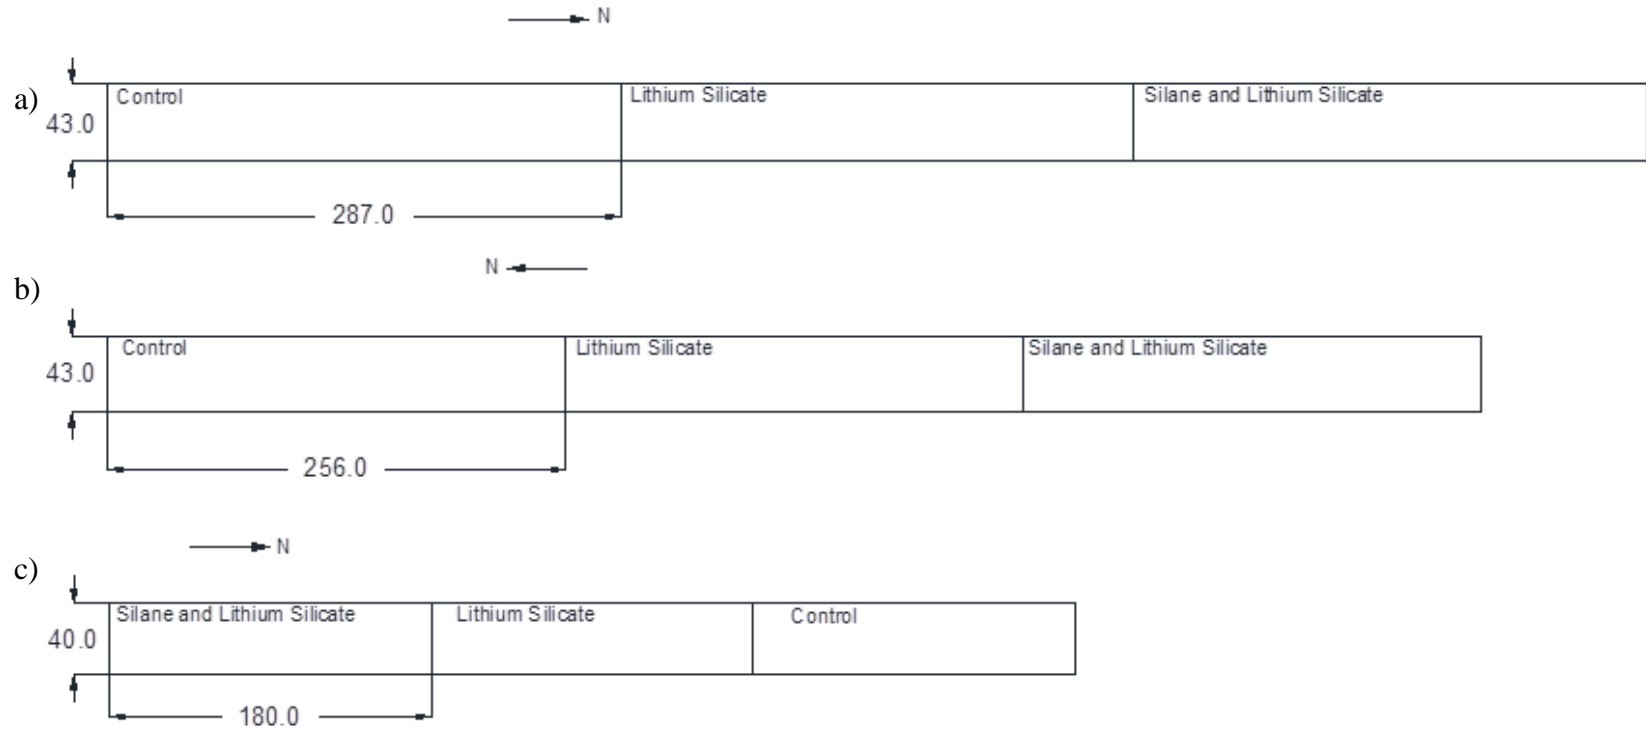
Test locations on experimental sections at a) 8200 South bridge parapet, b) Dannon Way bridge parapet, and c) at-grade highway barrier wall.
